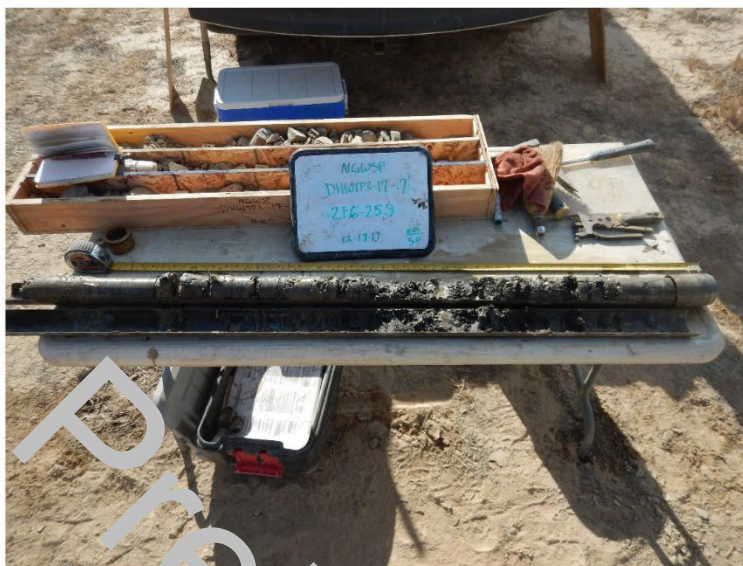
/17/2017 NGWSP, SJWTP, DHWTP3-17-7 (21.6-25.9 feet). Photo By: P. Gardner
